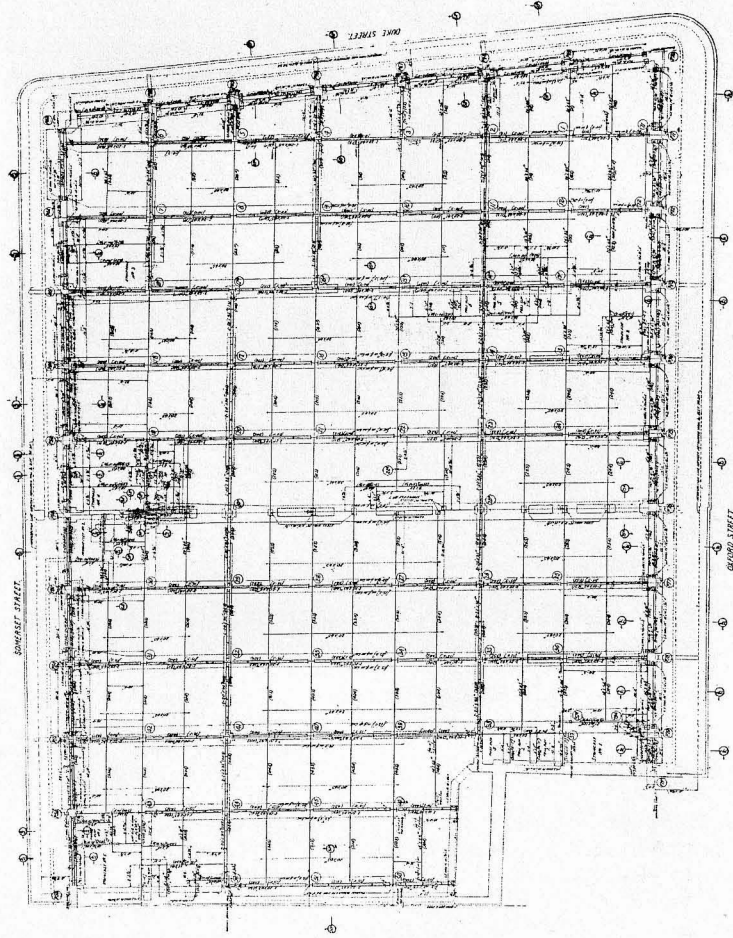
Selfridges: the ground floor framing plan and the completed layout (from *Concrete and Construction Engineering*, March 1909).
